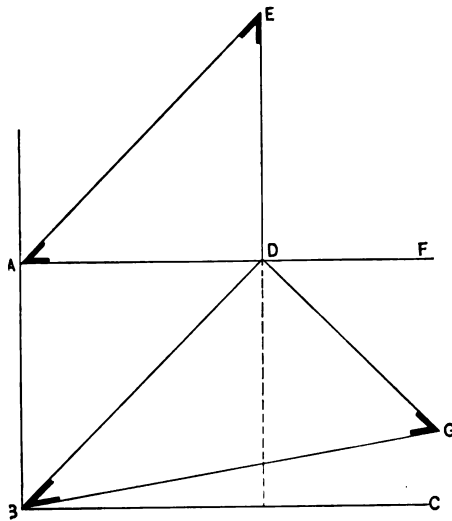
Plan of Corner of a Roof with Ogee Rafters.
